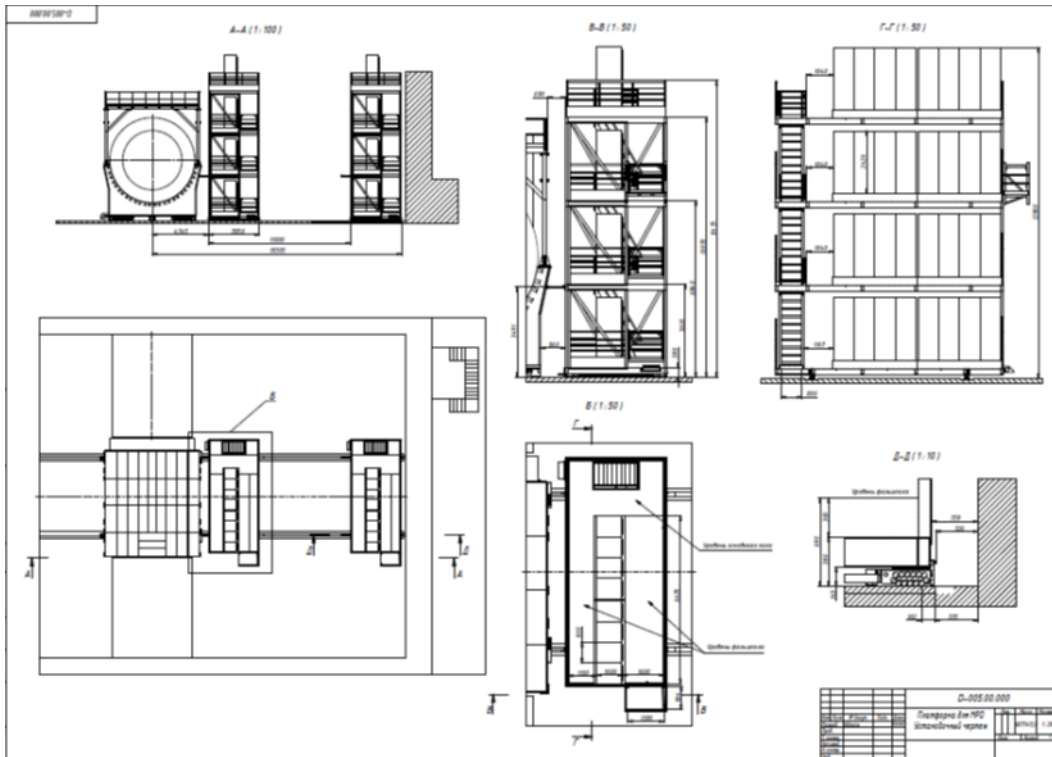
15; PLATFORM MPD-NICA and MPD, mutual position and assembly.
